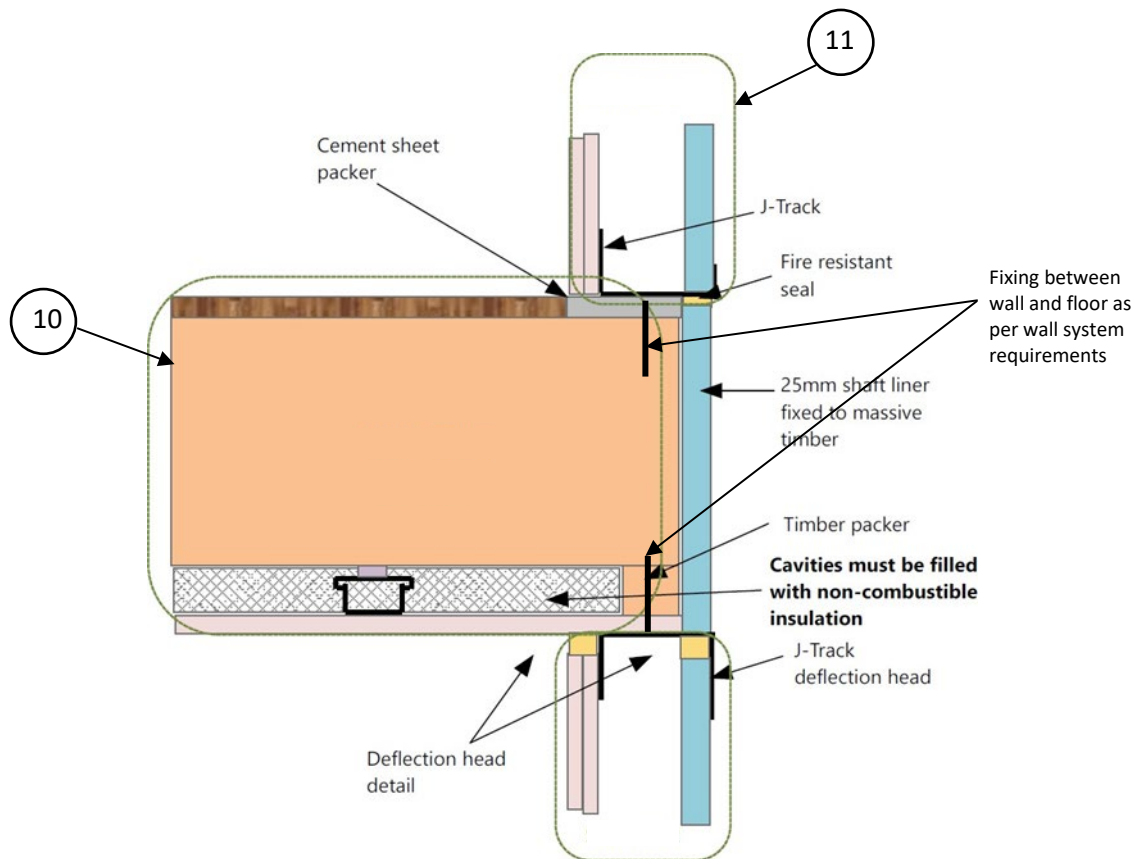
Steel stud shaft wall interface with massive timber floors maintaining shaft continuity – Section view
